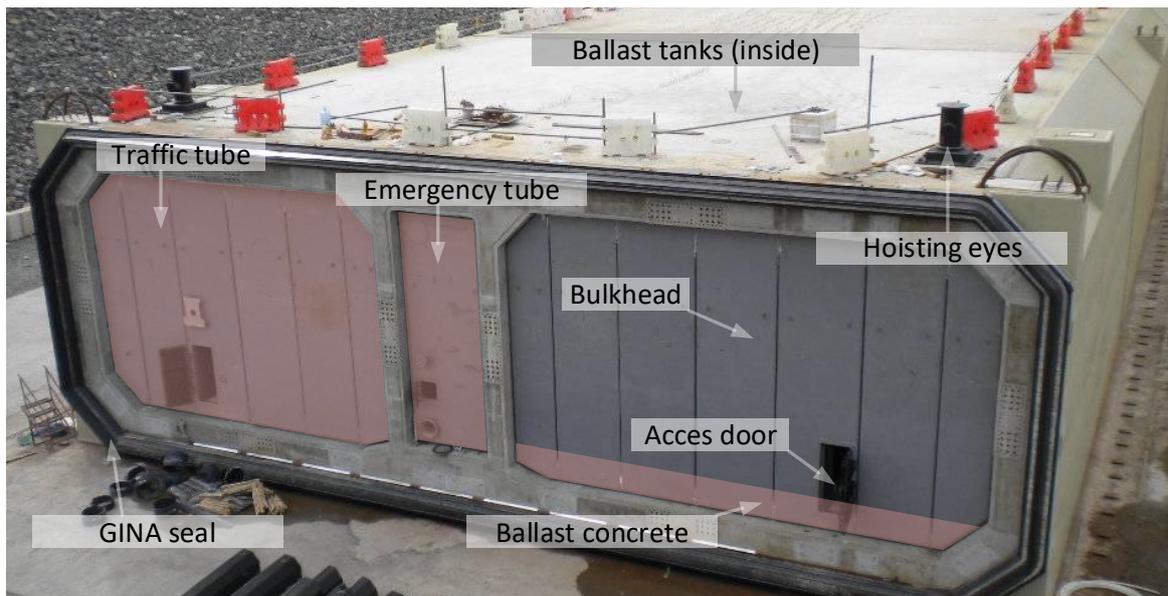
, TYPICAL IMMERSED TUNNEL ELEMENT (ECPLAZA, 2020)
